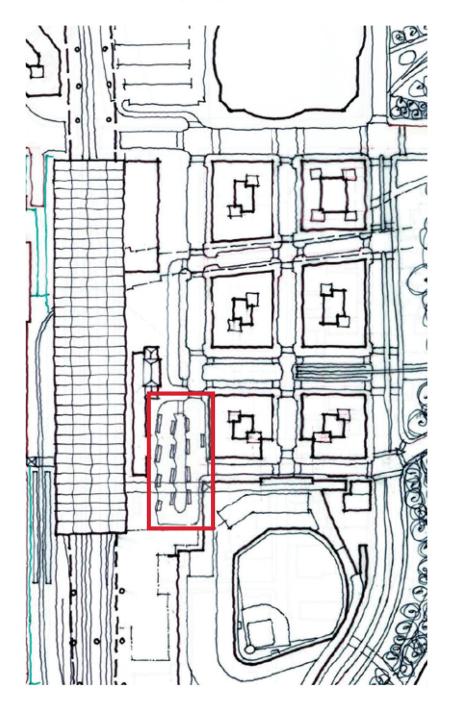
AUTUMN PARKWAY IMPROVEMENT PROJECT
